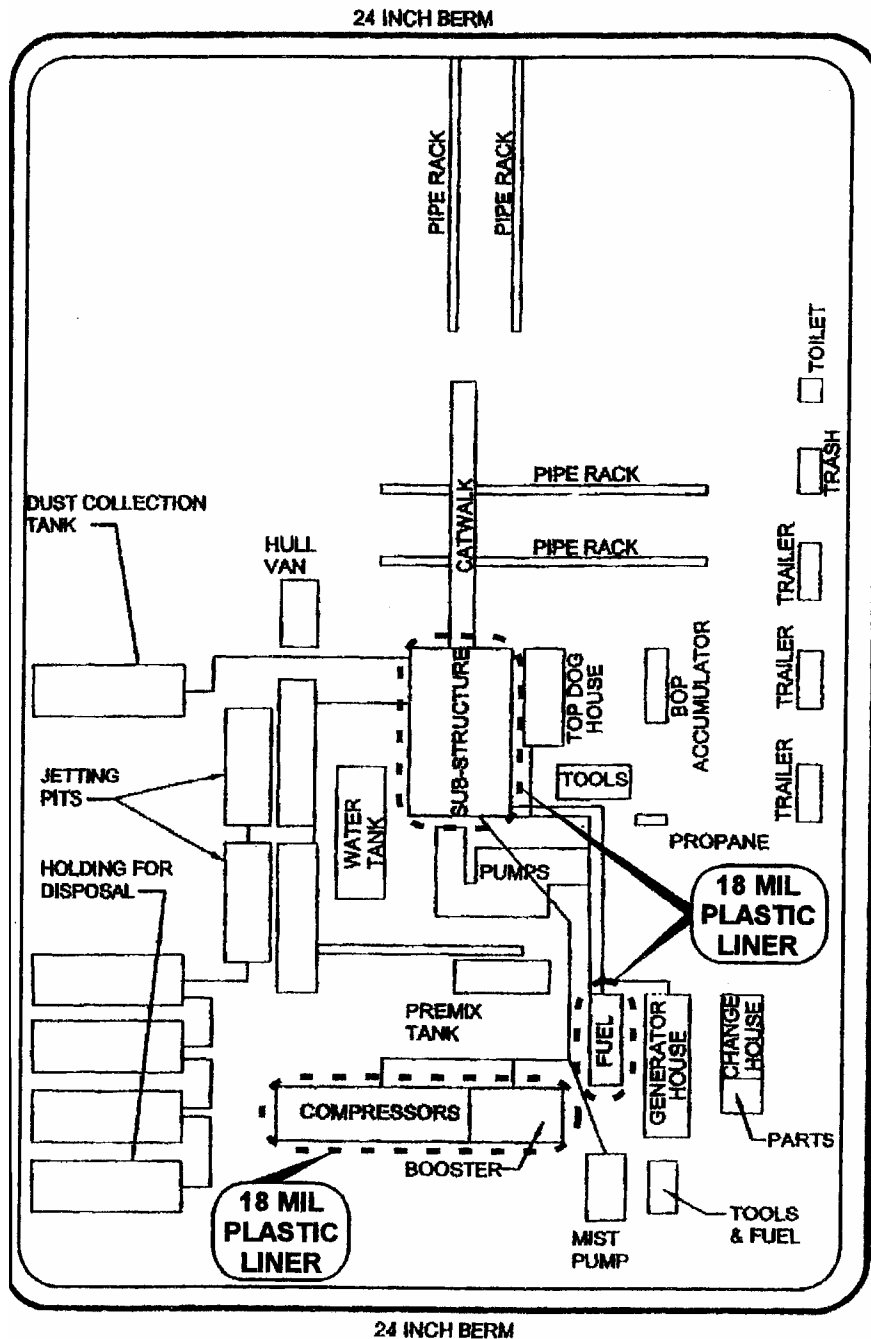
Diagram of equipment layout on the location Shelton A-2X well pad
